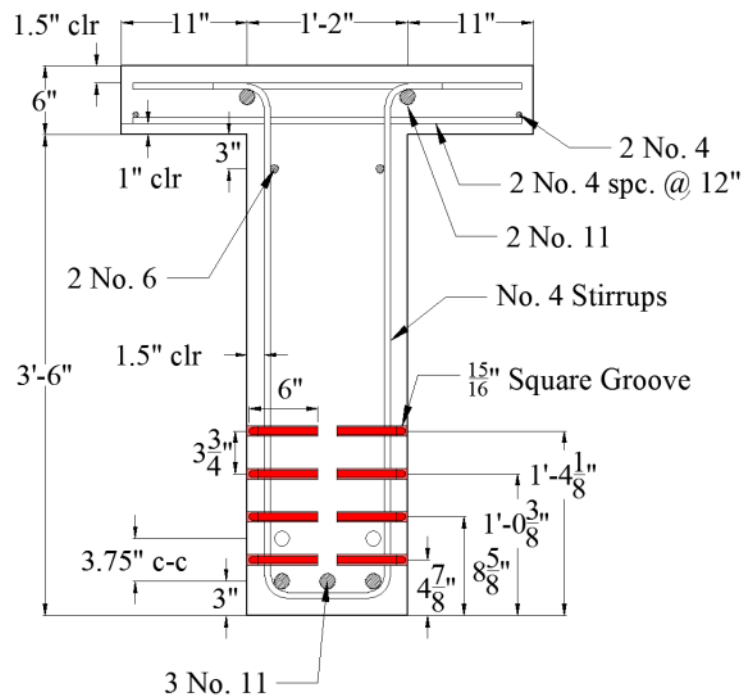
Cross section for specimen T.45.Ld3(6).SS
